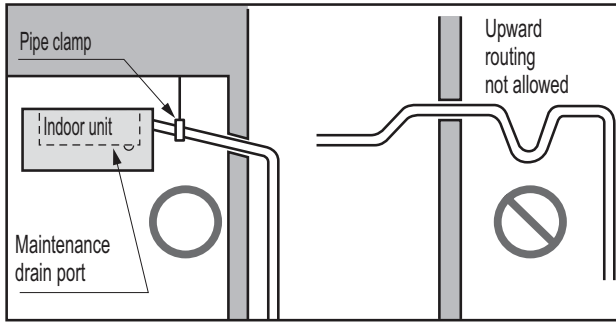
Ceiling Cassette Indoor Unit Drain Pump to Drain Piping System
